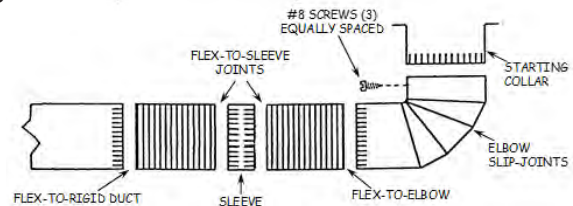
OVERLAPPED SEAMS AND MECHANICAL FASTENERS
